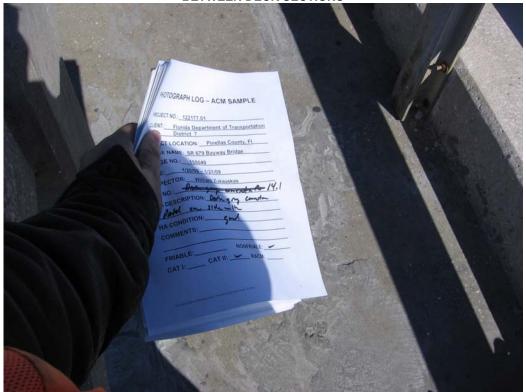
01/21/09 - SAMPLE 14.1 - HA 14 DARK GRAY CONCRETE PATCH ON WEST SIDEWALK
